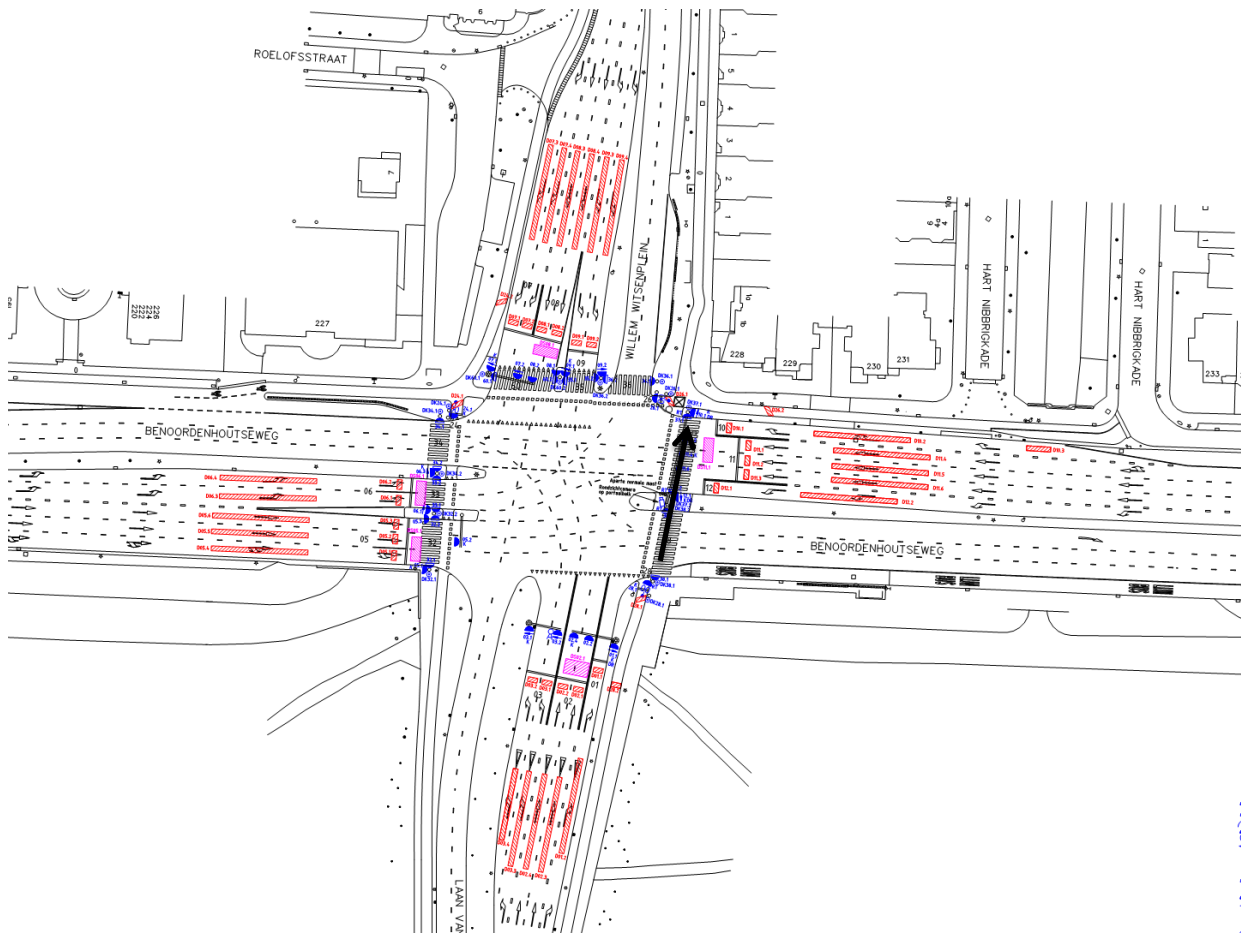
Intersection Laan van NOI- Benoordenhoutseweg
